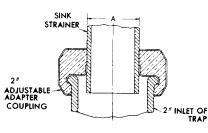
11/2-in. Tailpiece Assembly
